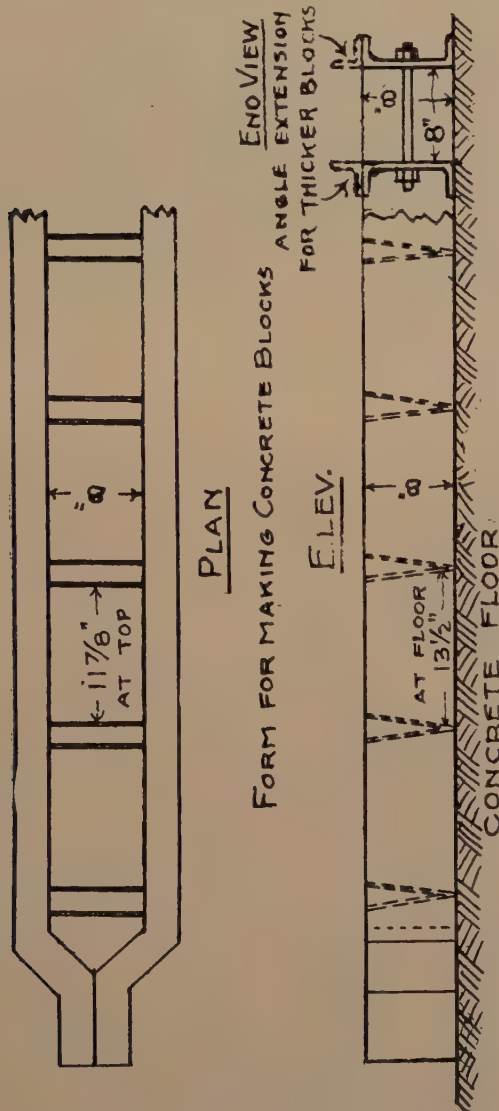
PLAN AND ELEVATION OF STANDARD FORMS FOR MAKING CONCRETE BLOCKS.
